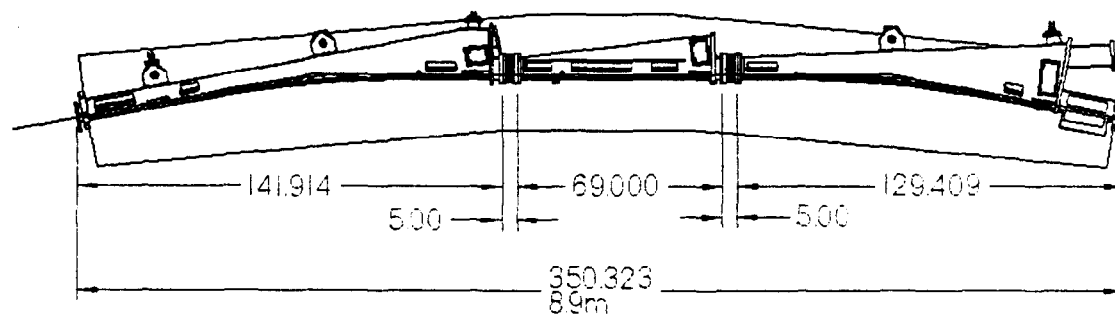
Standard Girder Section Chamber Layout
